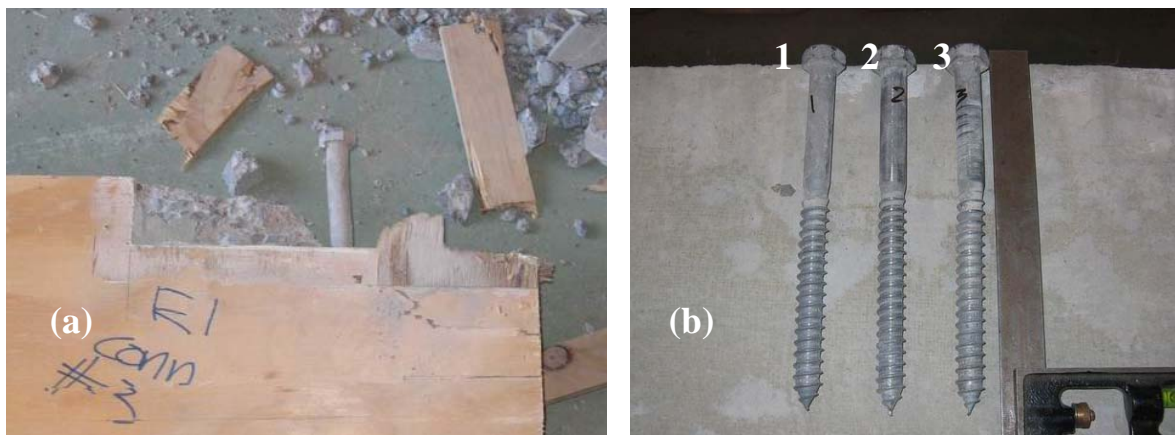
(a) Dismantling of beam E1 after test; (b) Coach screws 1 (nearest to support), 2, 3 (nearest to point load at one third span). Only coach screw 3 had slight bent.
